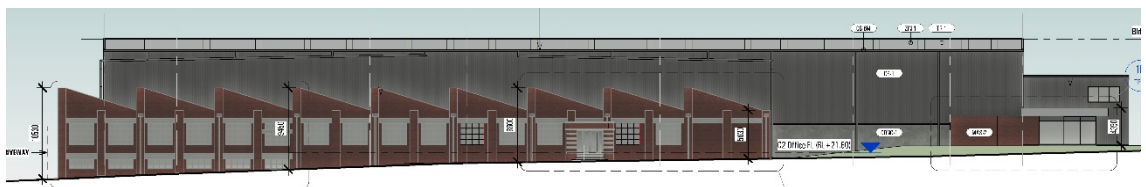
Proposed east elevation of new Building C and C1 as well as retained section of Building E
